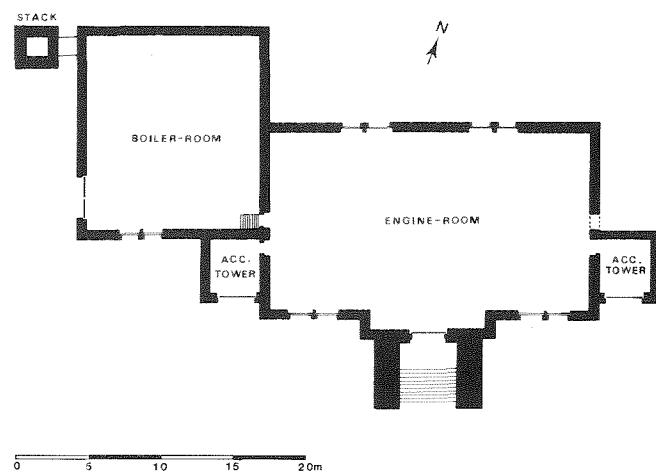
Plan of Bullock Island Hydraulic Power-House, 1877, adapted from later plans.
